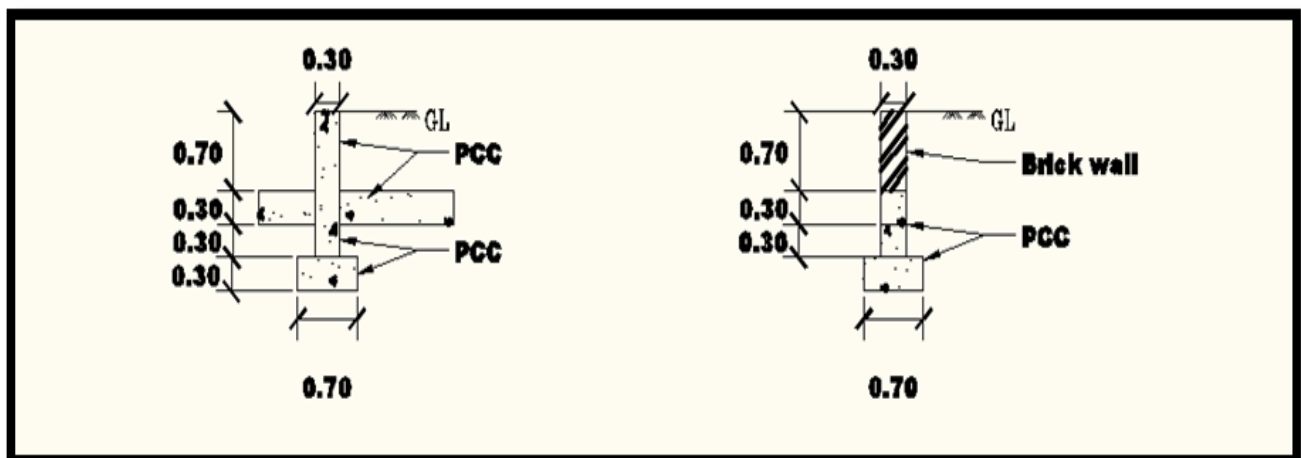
Section X-X & A-A plan for wall and footing of composting structure
